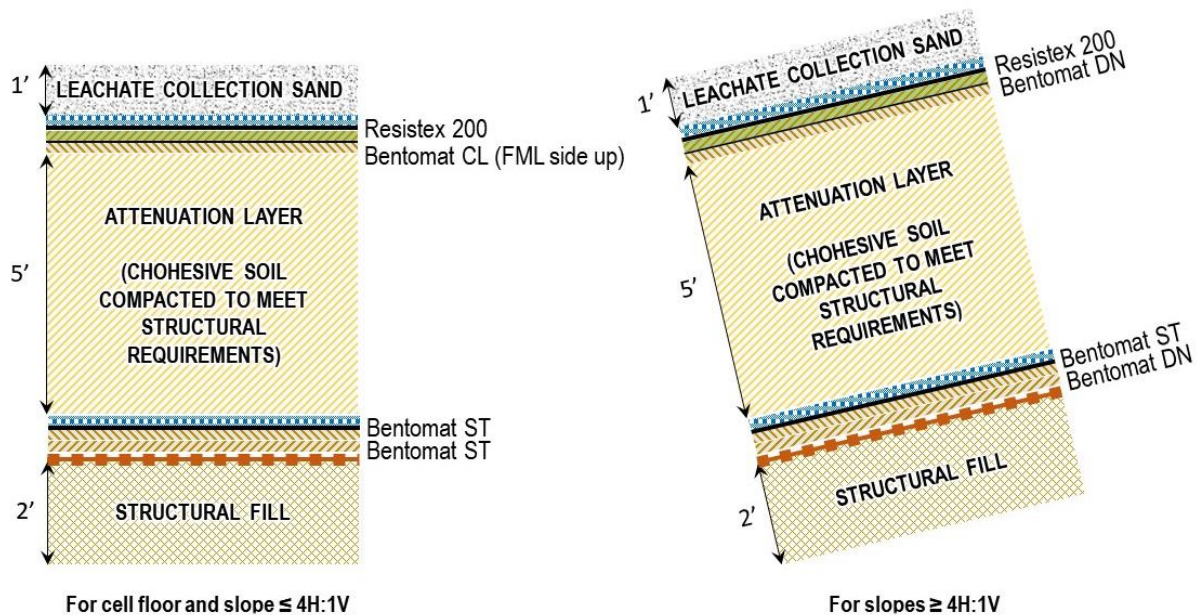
Proposed MC VI-F and MC VI-G Base Liner Construction Detail.
